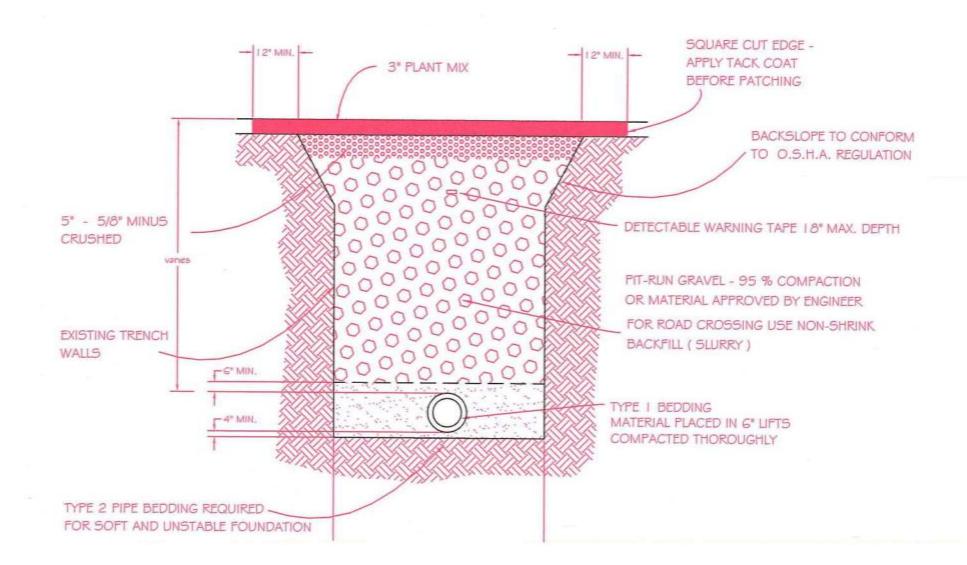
TYPICAL TRENCH AND ASPHALT PATCH DETAIL
